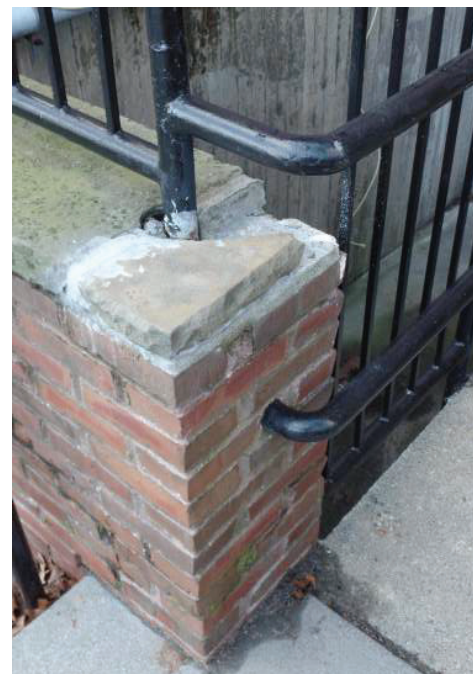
Damaged Masonry and Cap Stones at Tappan Gym/Pool Complex Entry Ramp
